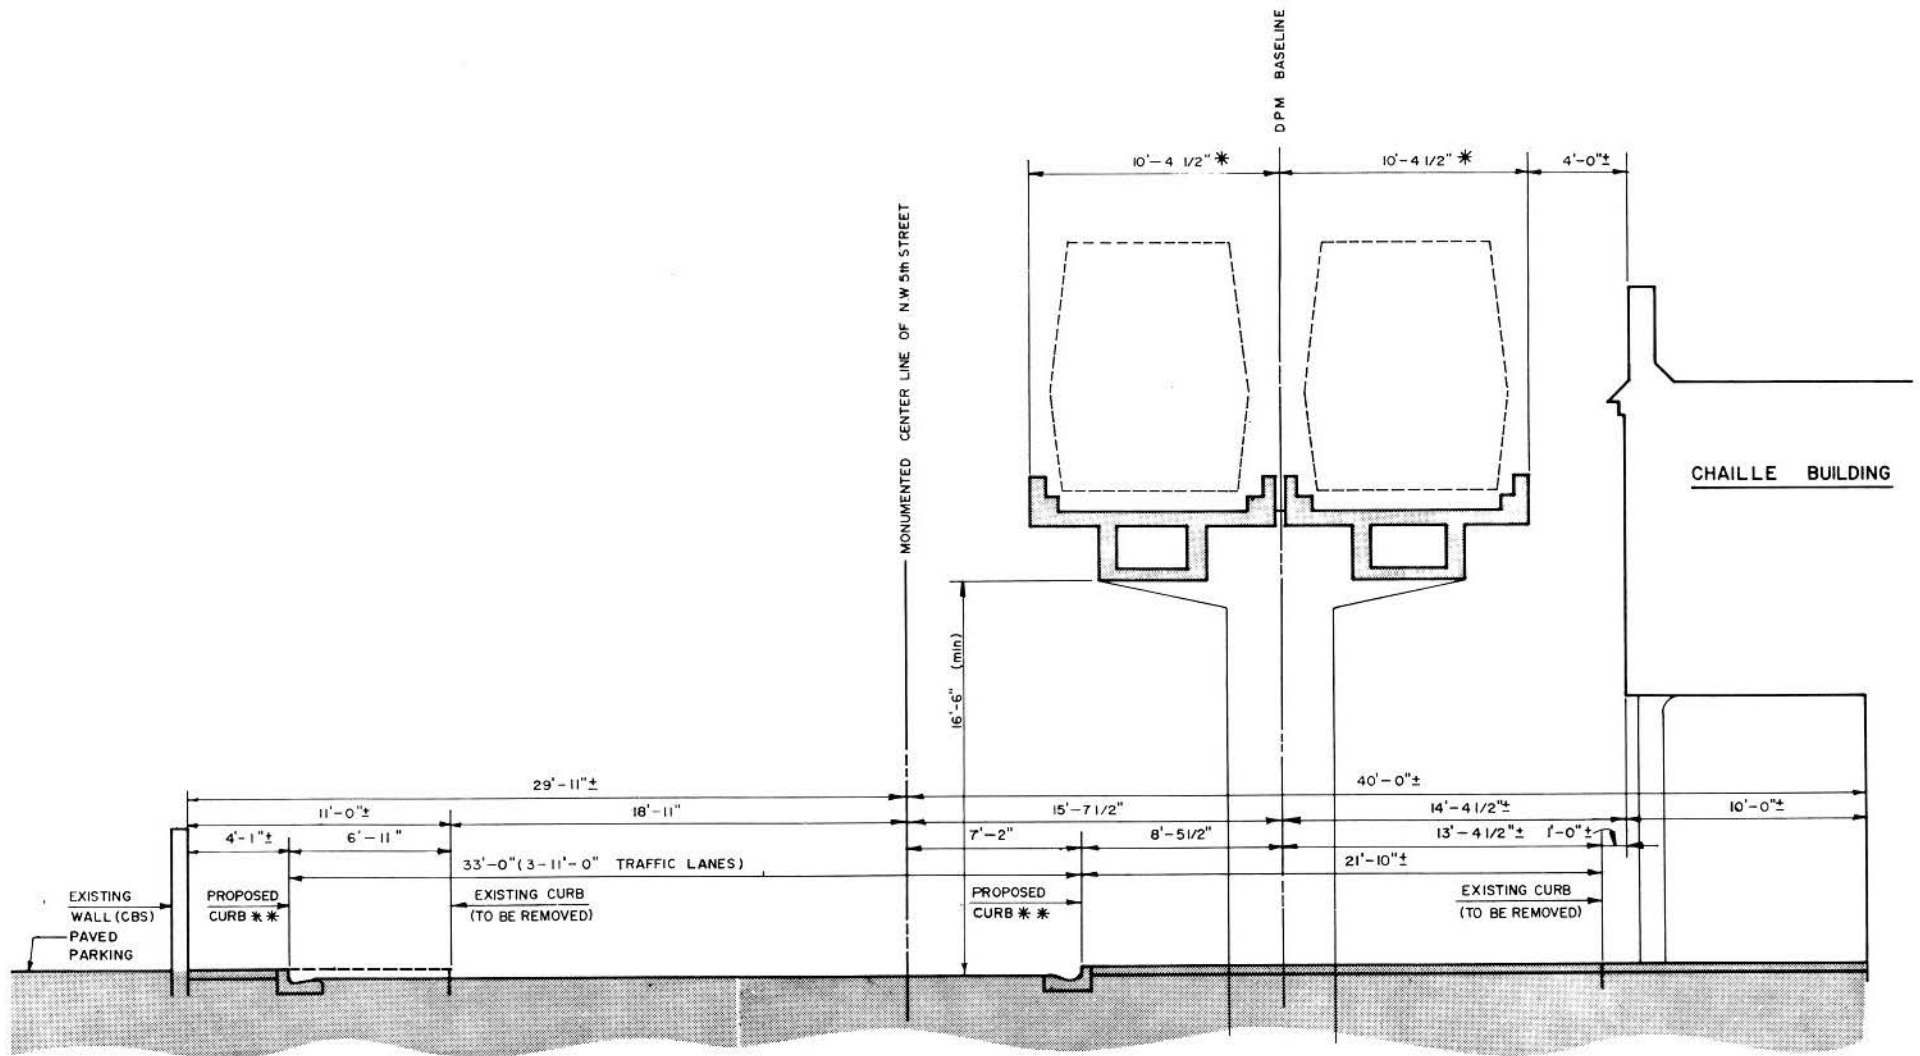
GUIDEWAY CROSS SECTION AT N.E. 5TH ST. AND MIAMI AVE. (LOOKING EAST)
